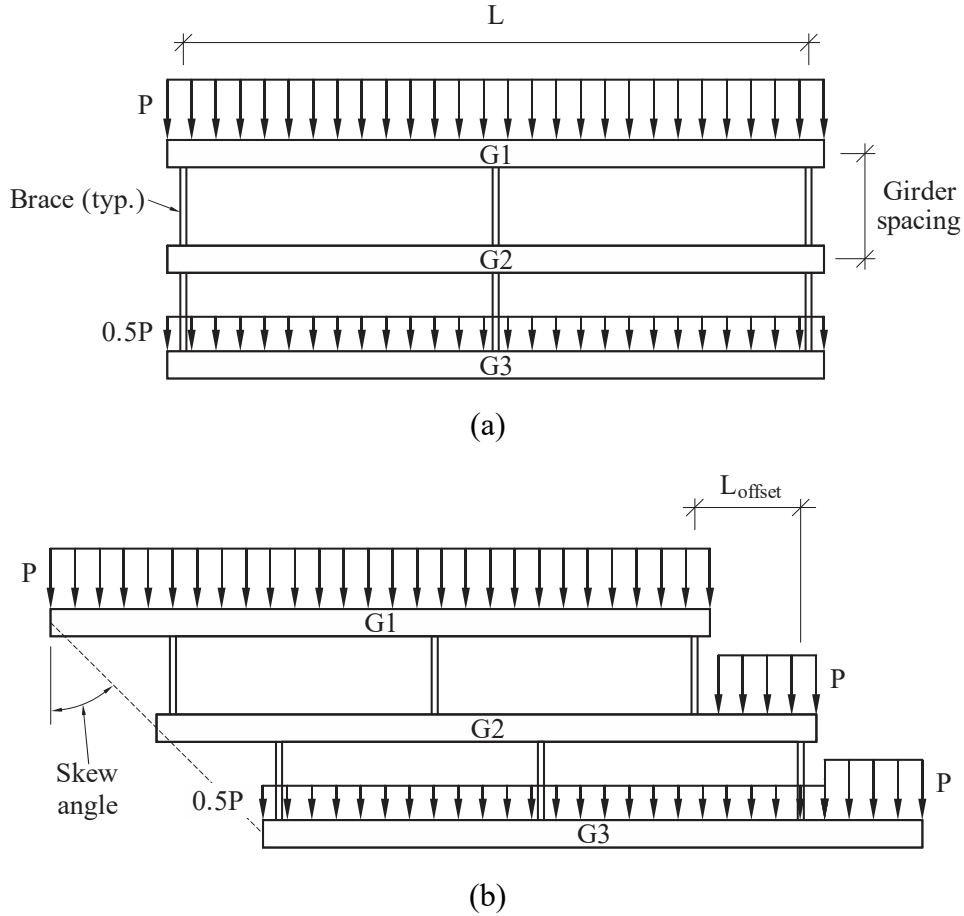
Effect of bridge skew on wind loading of braced 3-girder system (plan view):
